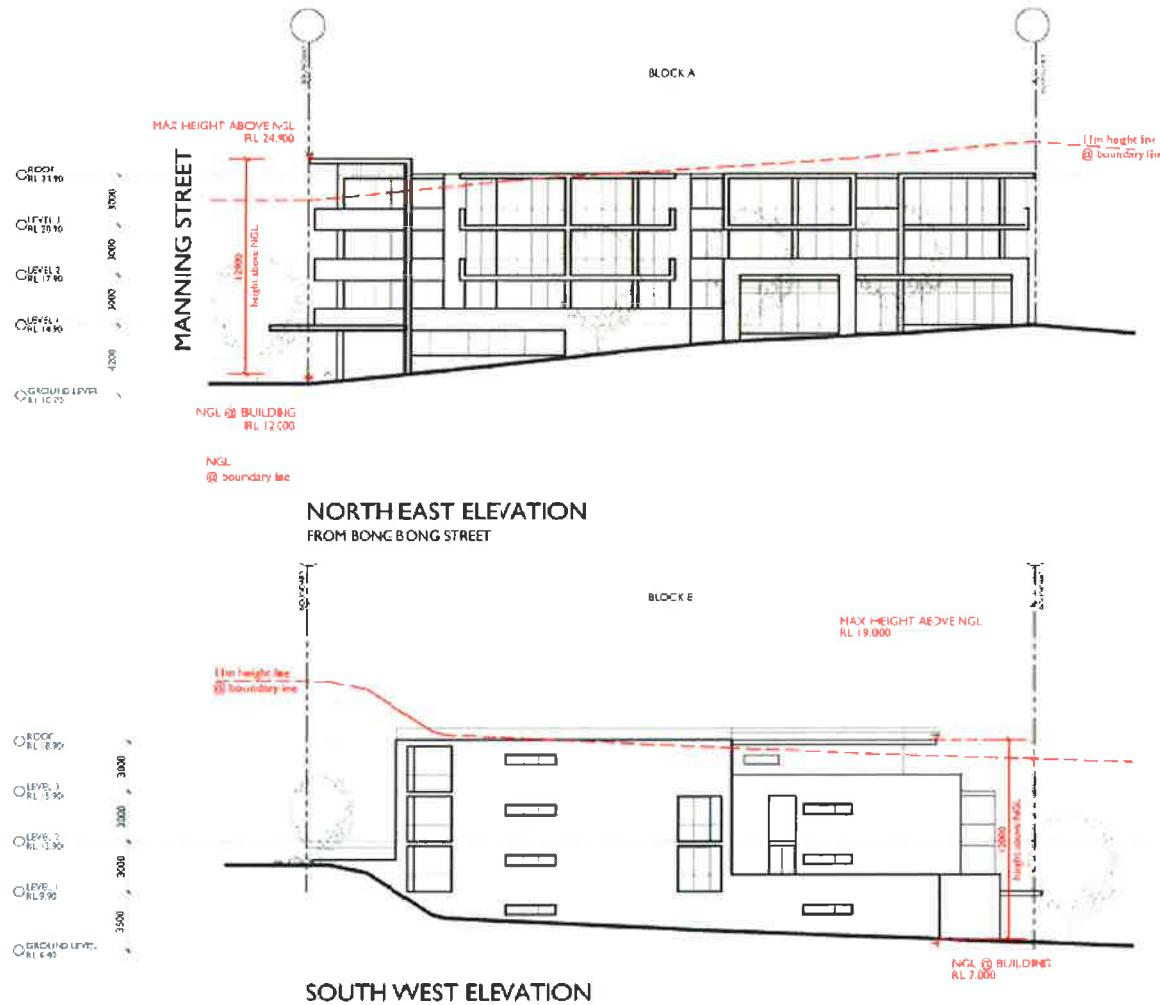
Excerpt from ADM Architects Dwg A10 Rev B (Elevations) indicating portion of building exceeding 11m building height
